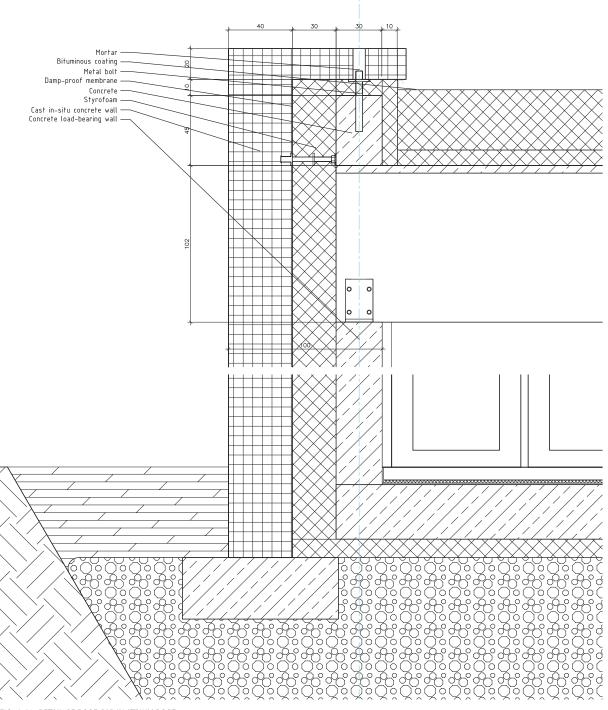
DETAIL OF ROOF CAP IN ATRIUM ROOF.
